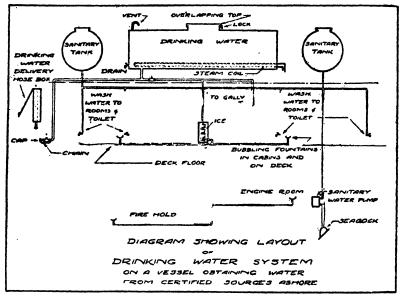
Section showing layout of drinking water system on a vessel obtaining water from certified sources ashore.
